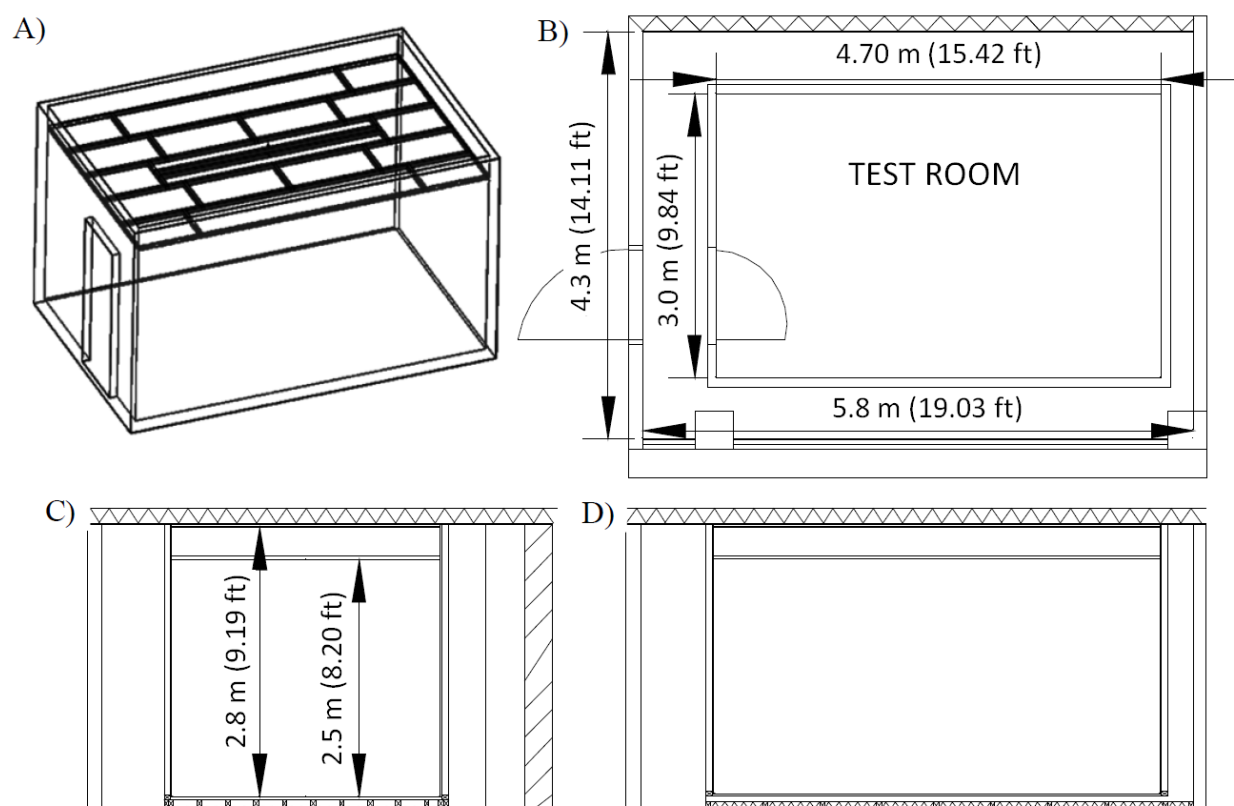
Construction of the full-scale test room: A) Geometry of the full-scale test room with suspended ceiling shown in case 2, B) top view of the test room and external room with constant temperature, C) side view (widthwise) and D) side view (lengthwise)
